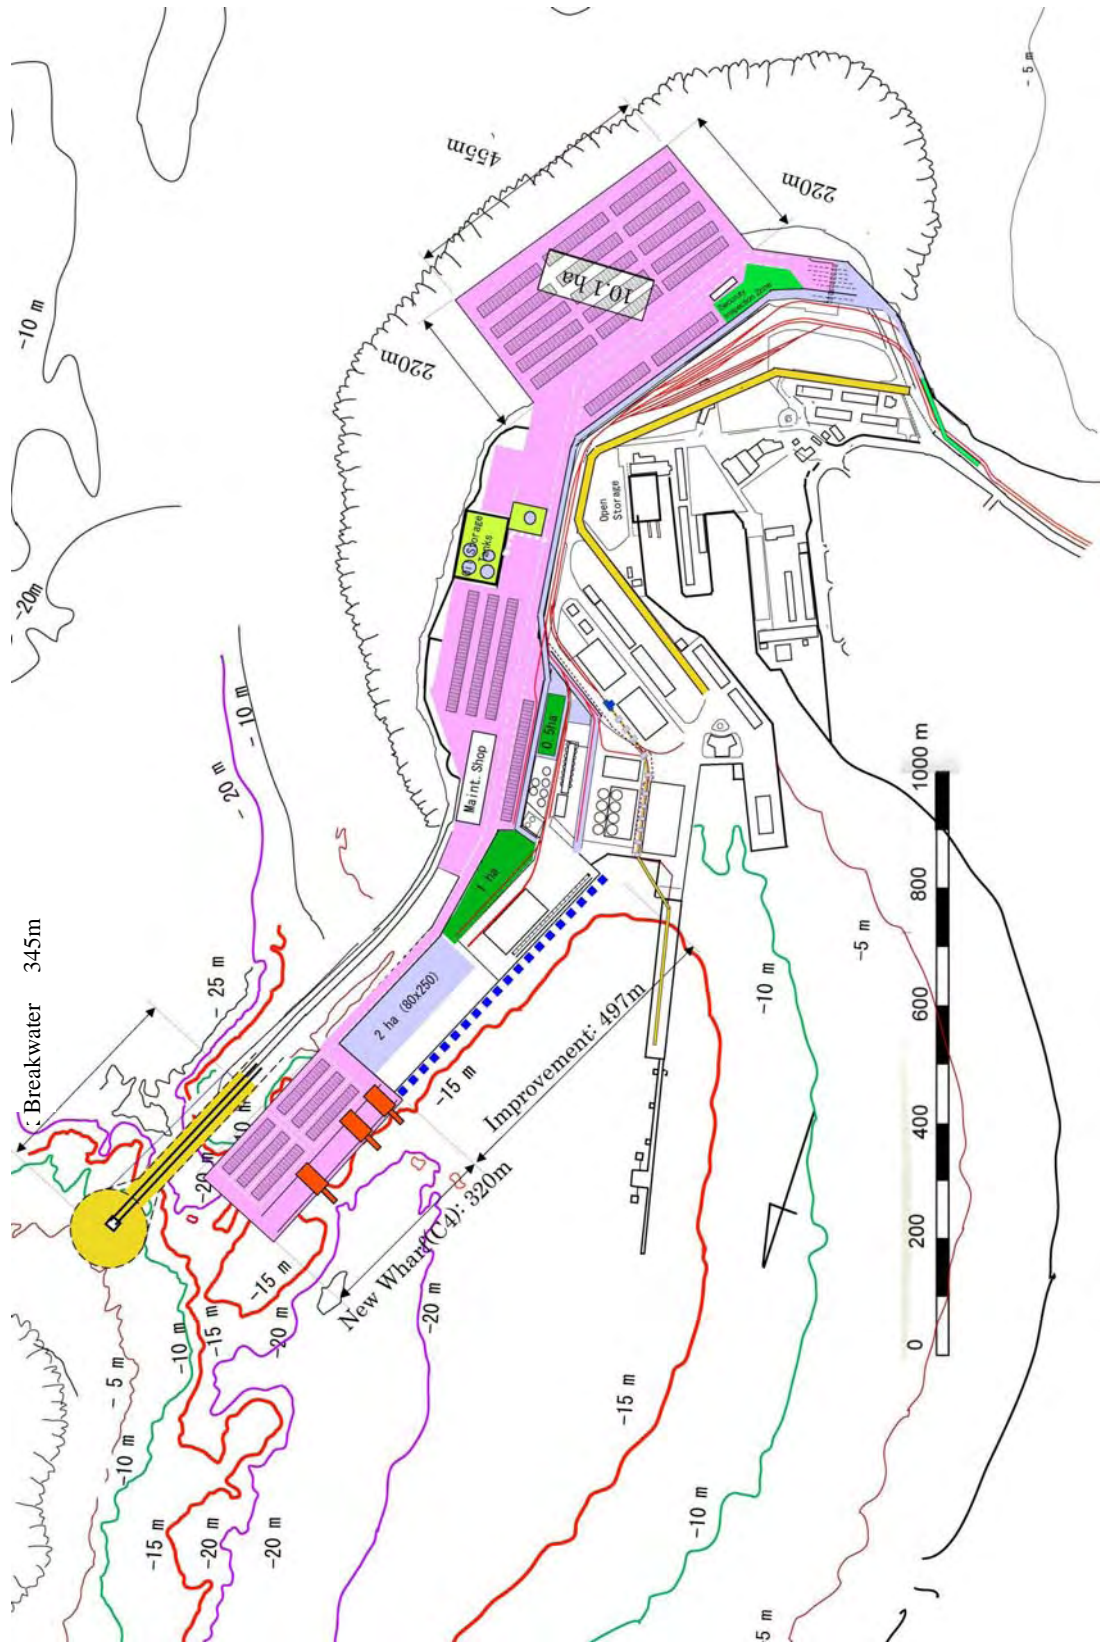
Layout of Port Facilities in Urgent Development Plan for Tamasina Port,
